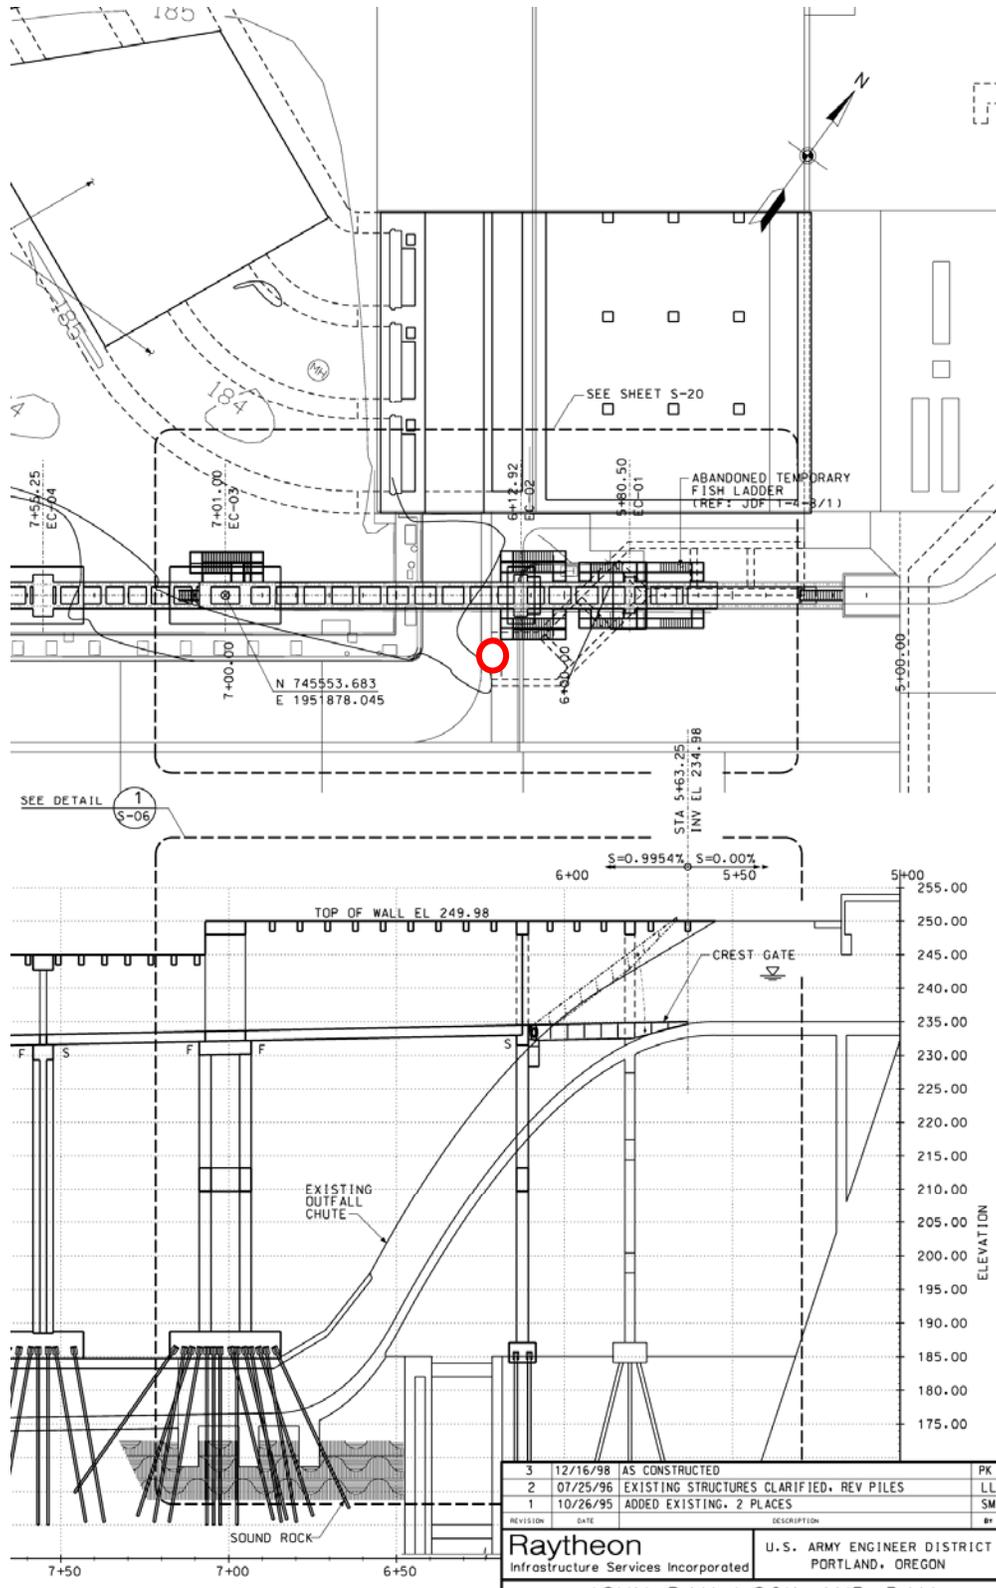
Plan & Elevation of Site Area, JDF 2-10/14
